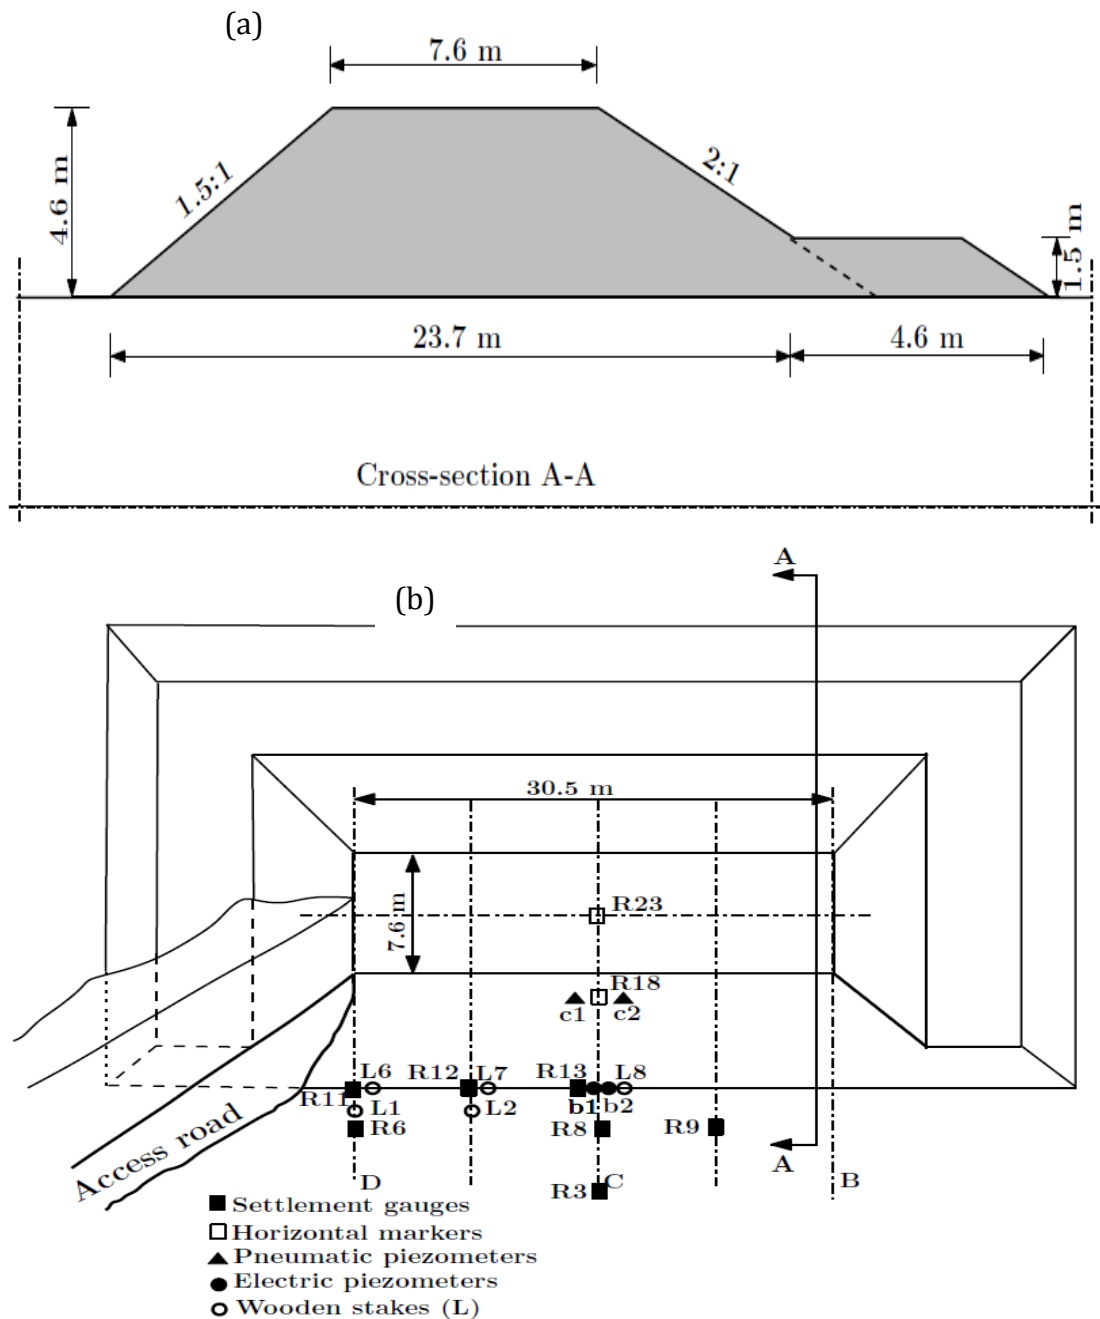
St Alban test embankment: (a) plan view and (b) cross section A-A of the embankment.
